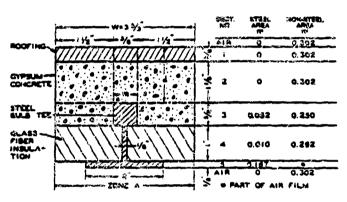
Gypsum Roof Deck on Buib Tees (Example 4)
